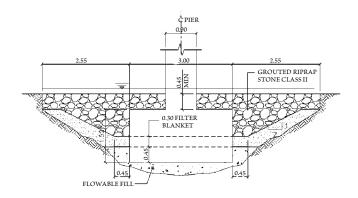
Typical section for scour and exposed footing repair with flowable fill and grouted riprap.
